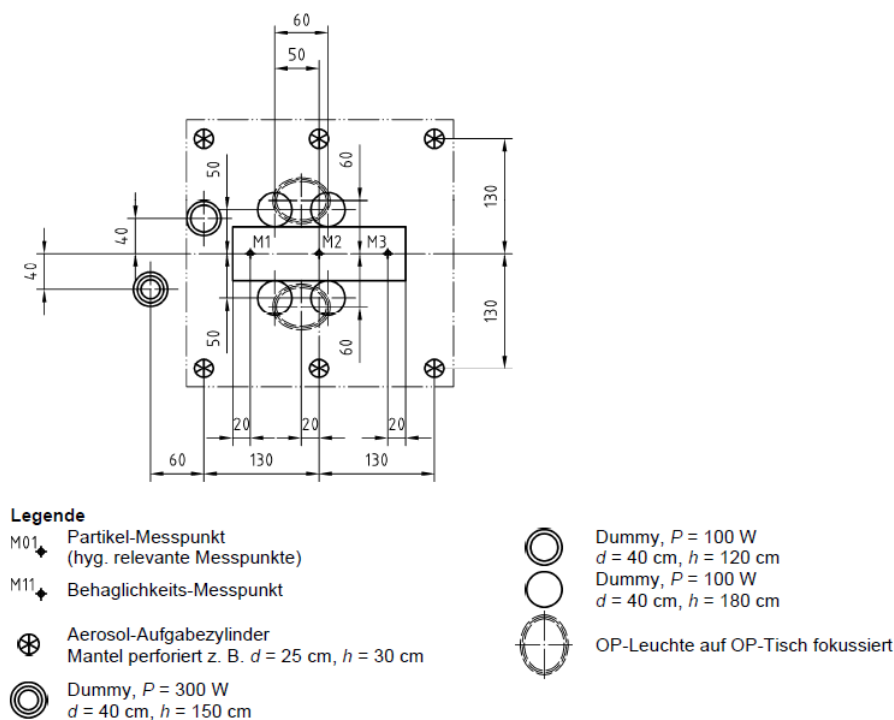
Reference load set-up for testing the protection against load entry from outside (from DIN 1964-4 [32]). External contamination layout
